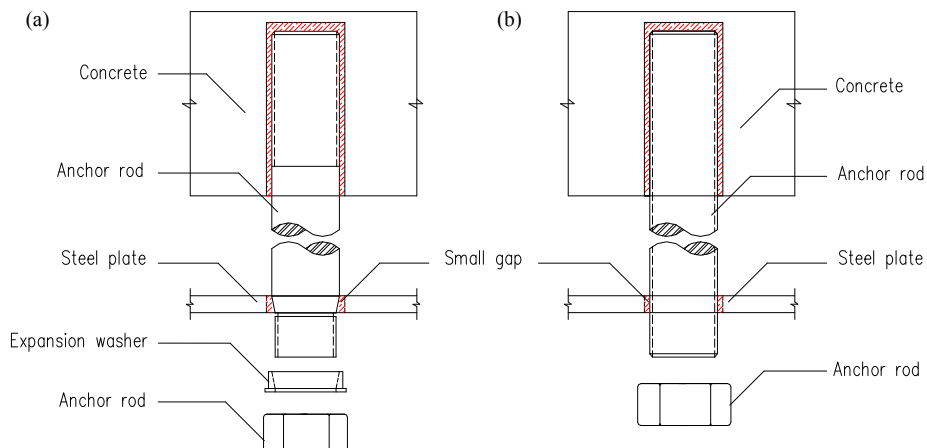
Installation details of anchoring rods: (a) Direct-shear anchorage system; (b) Conventional anchorage system
